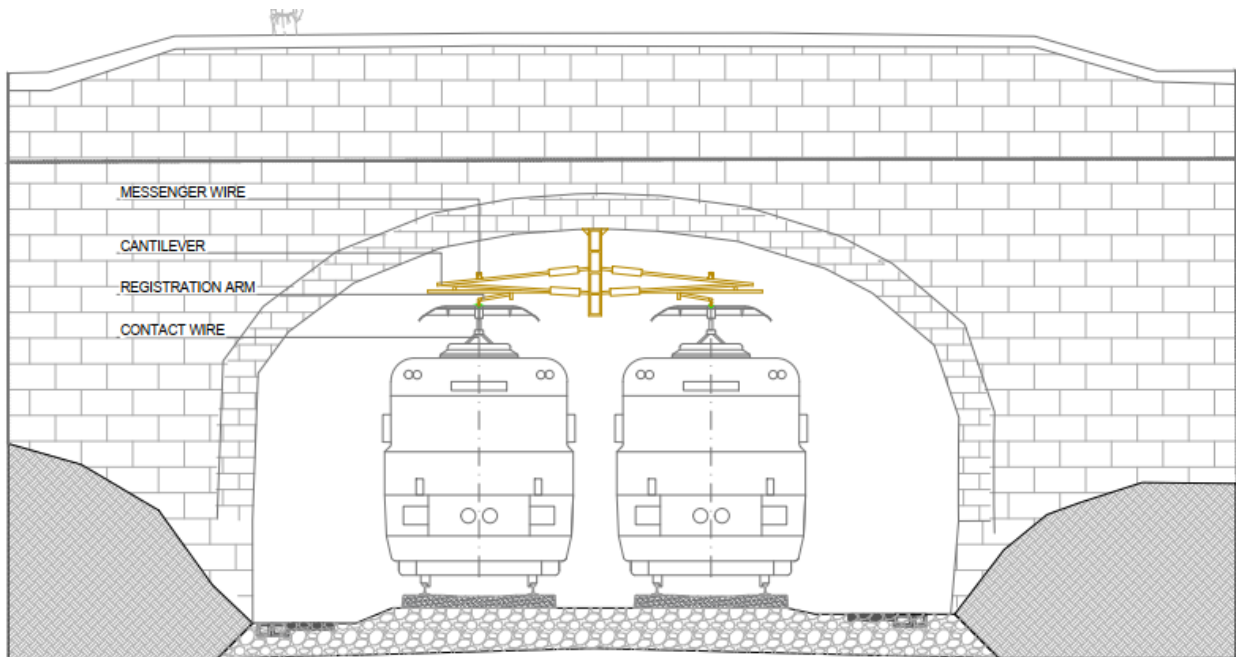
Typical OHLE Tunnel Cantilever arrangement
